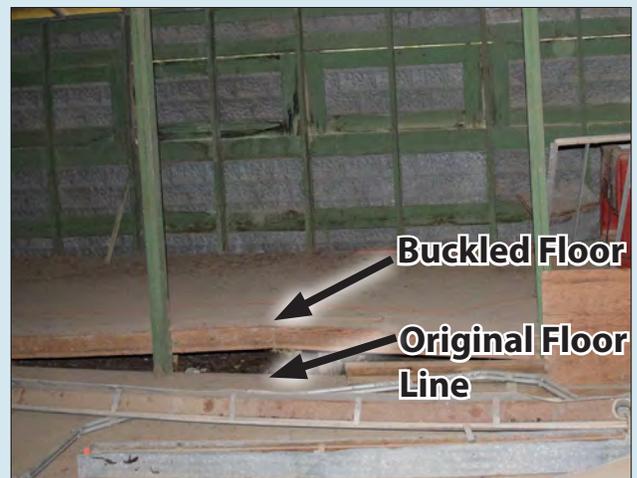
Floor to left of the center post is buckling upward, which may be result of leaking roof or shift in the foundation.
